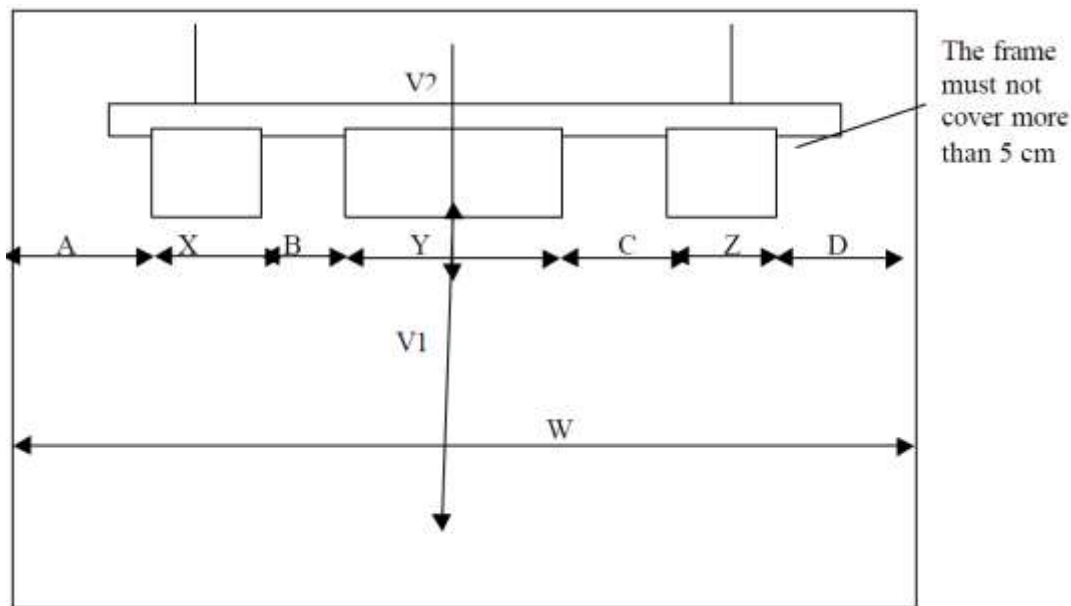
Diagram of South African Water Trough Barrier in Single Layer Configuration (MRAC 2002, p. 22).
